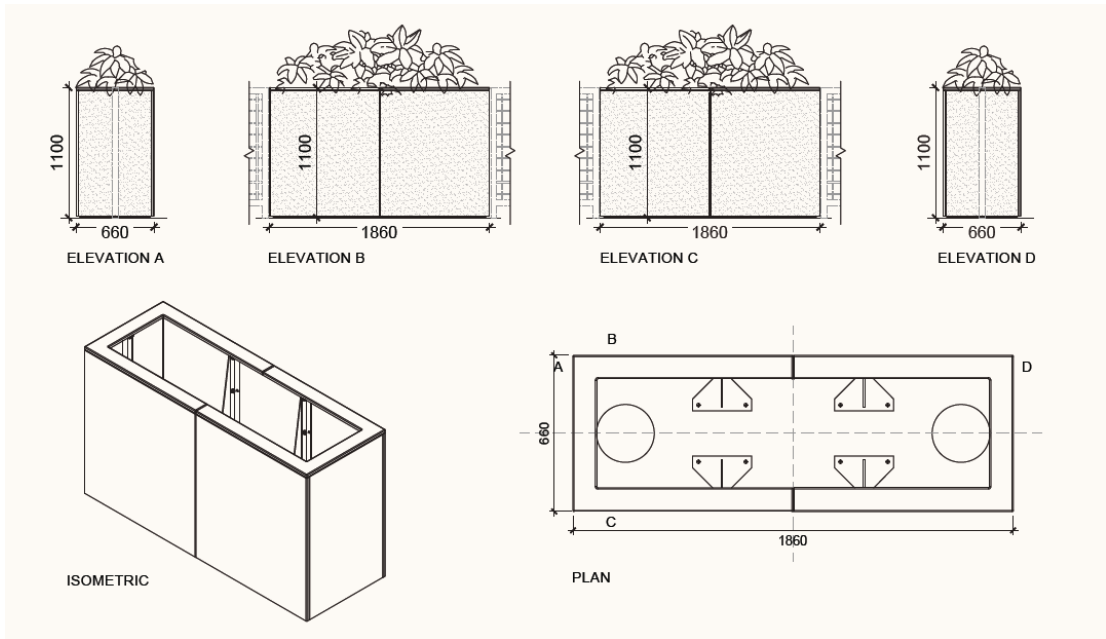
Detail of the proposed planter construction with integral HVM bollards
